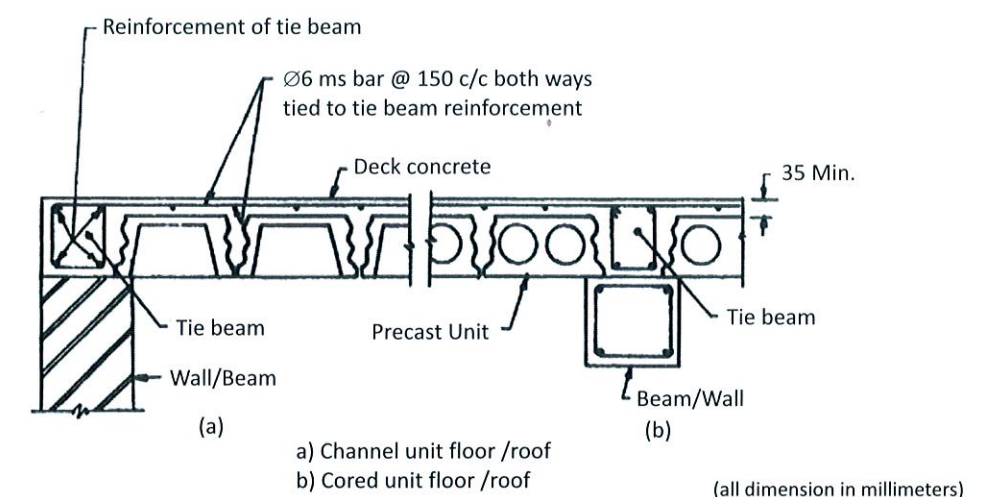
Connection of Channel/Cored Unit Floor/Roof (with Deck Concrete) with Tie Beam
